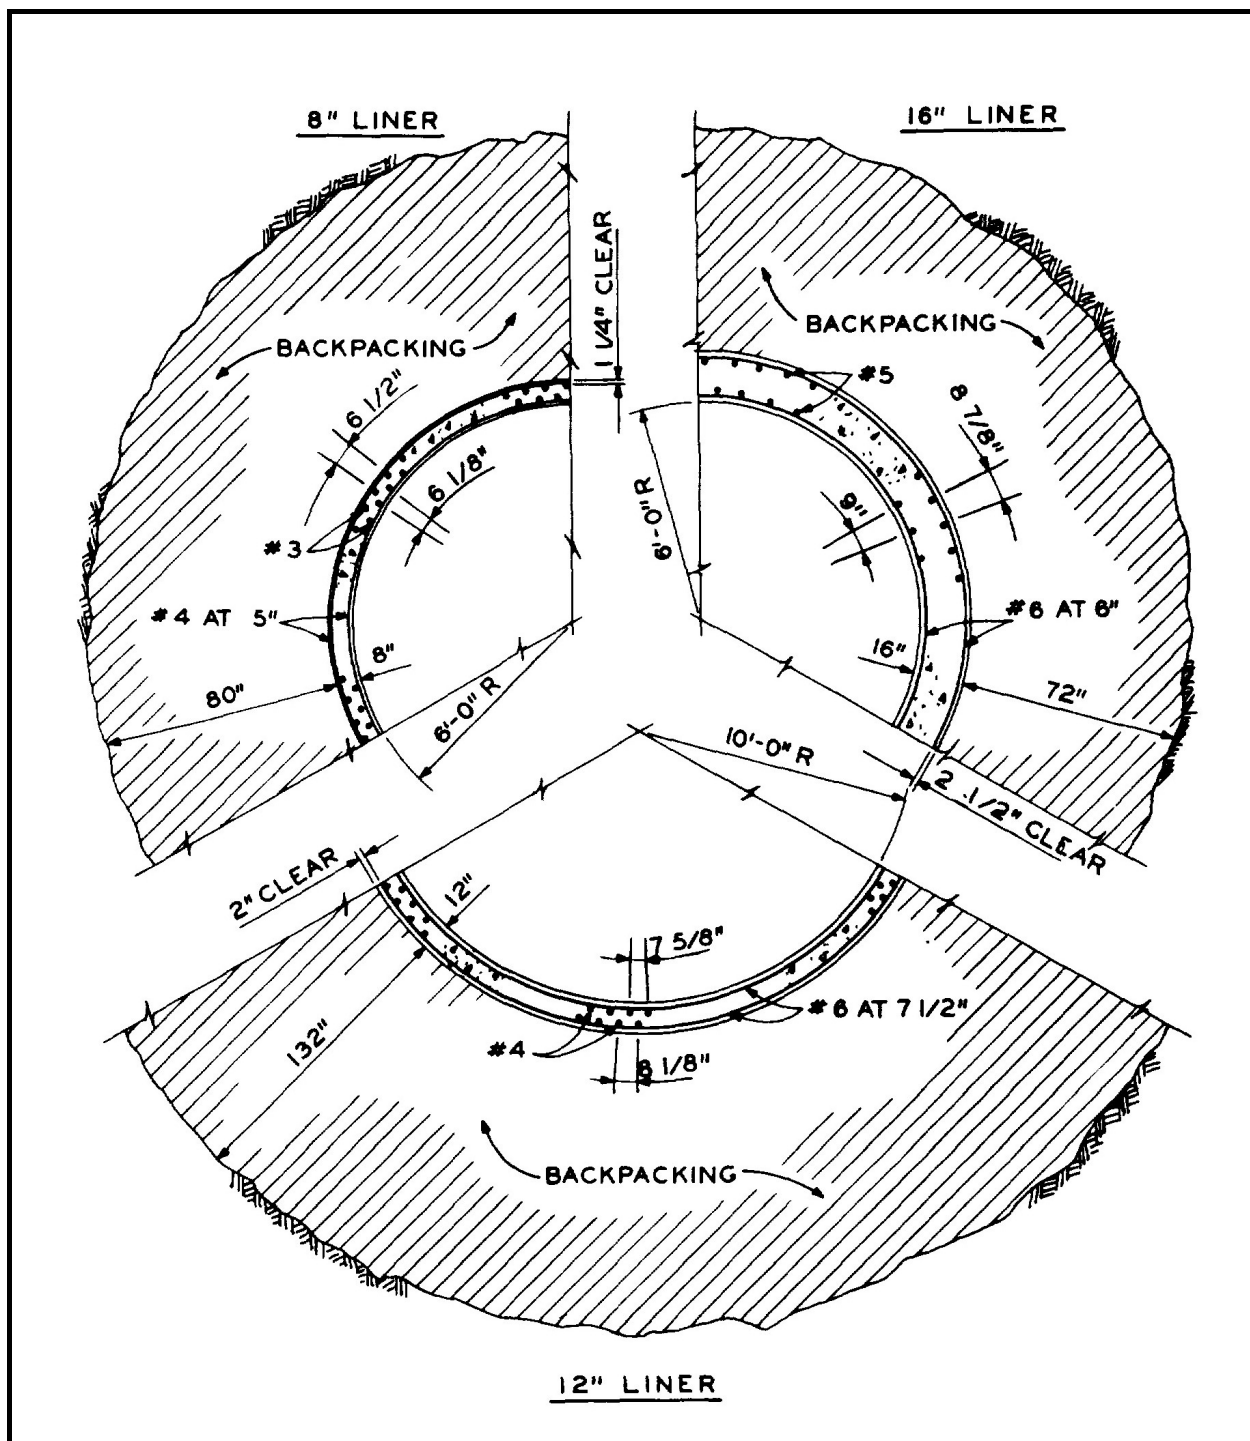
Examples of 8, 12, and 16 inch thick concrete experiment sections for the Pile Driver nuclear test (Distefano et al. 1970:96).
